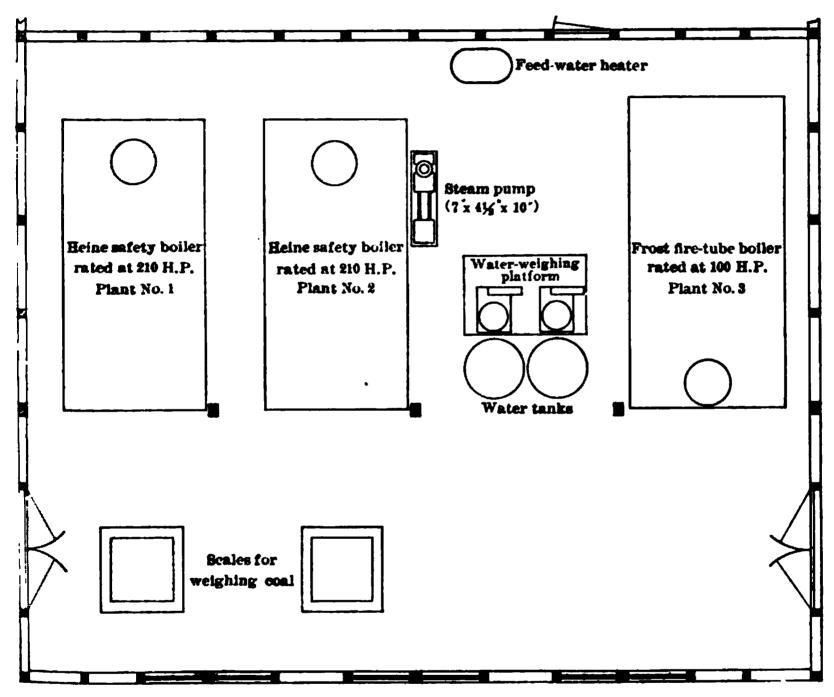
Plan of steam plant showing location of boilers and equipment.
